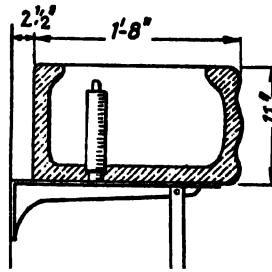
Scalding sink with end recess for vulcanite standing waste; 42 in. by 20 in. by 10 in.; cantilever brackets with cast-on studs fitted into holes under sink, and built into brick wall or screwed to partition.
